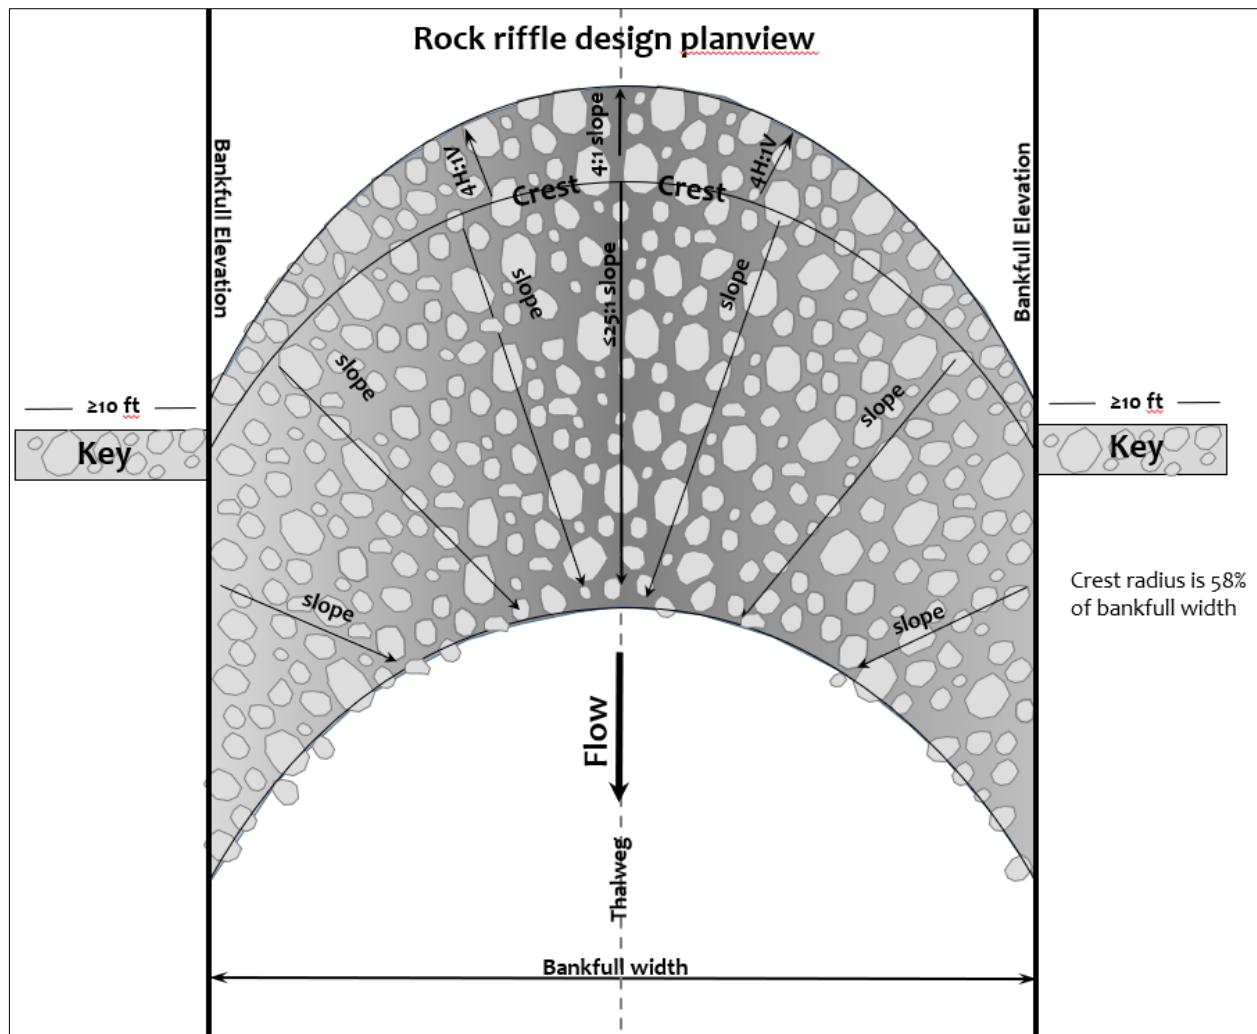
Generic Riffle Plan View Detail (Minnesota DNR)
